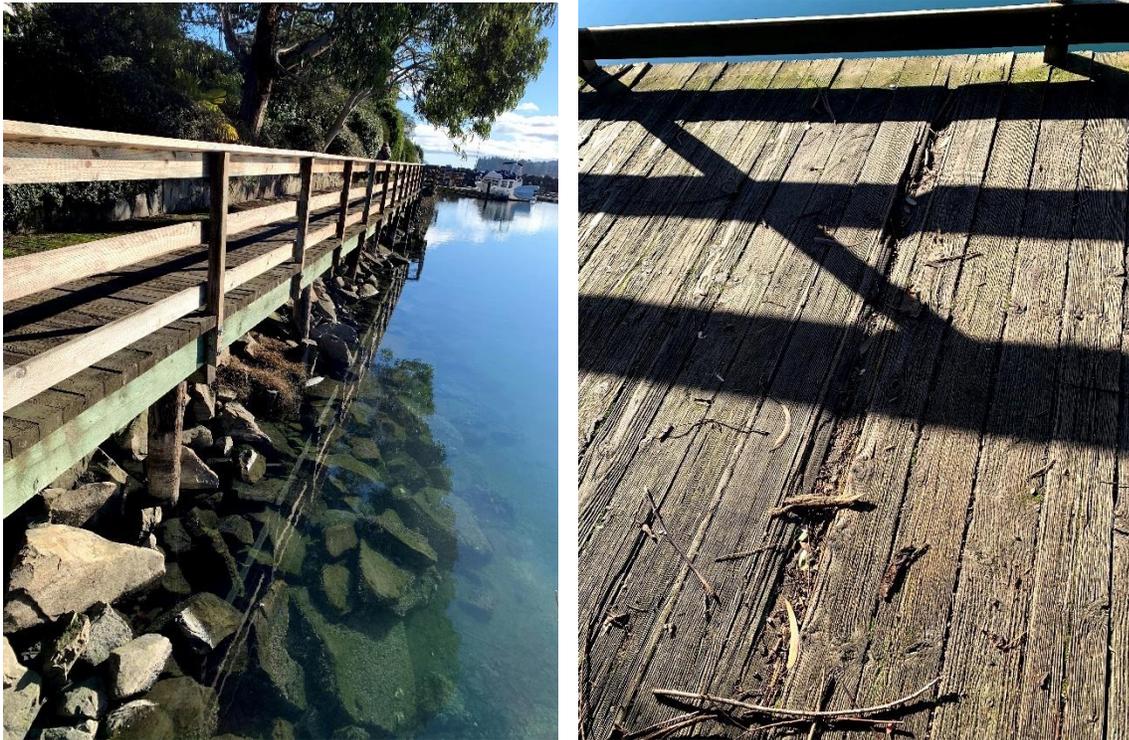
Section 7: (a) General view of boardwalk (b) Deck boards in very poor condition
